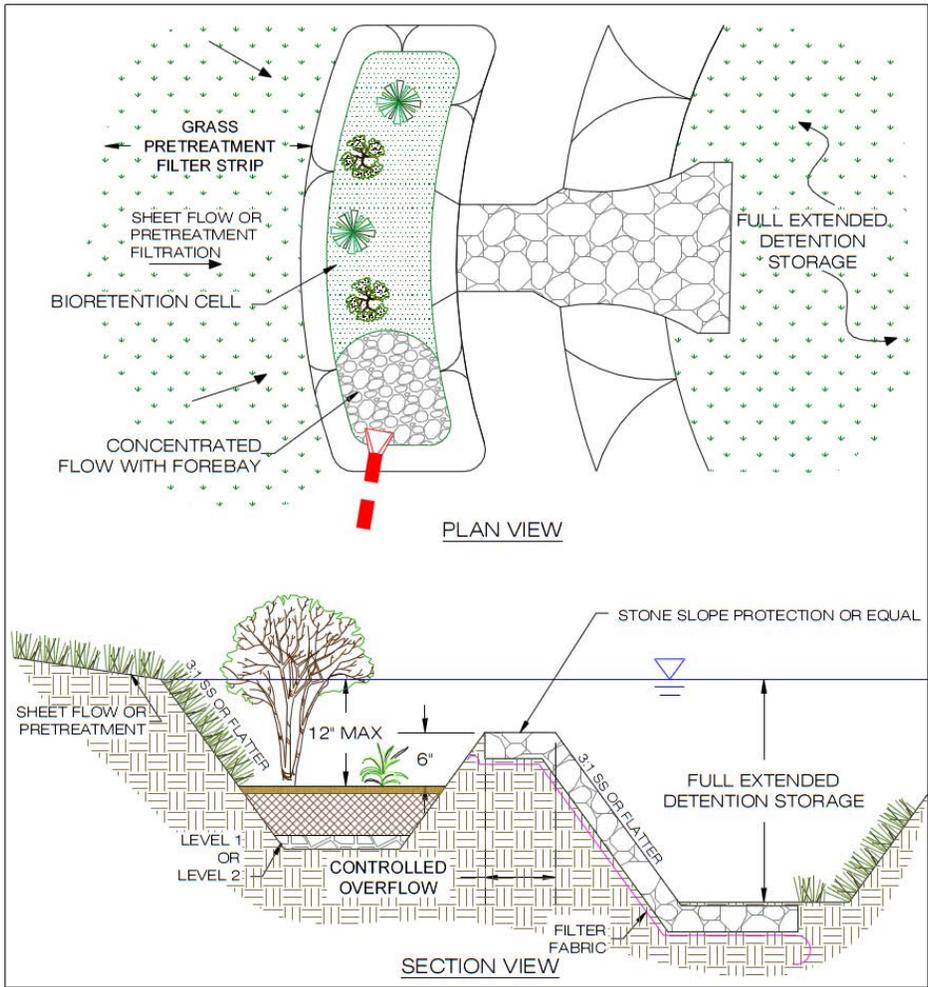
Typical Detail of a Bioretention Basin within the Upper Shelf of an ED Pond
